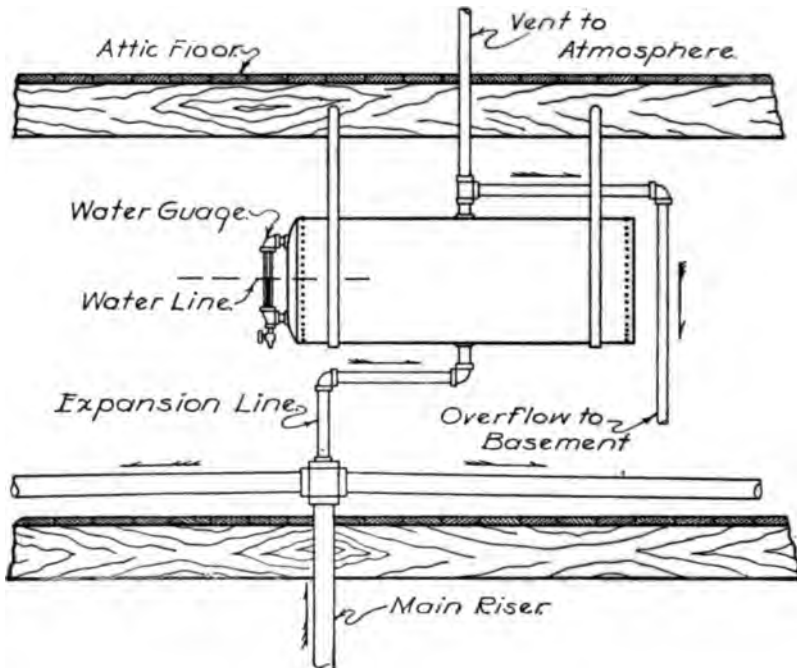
Expansion Tank Connection—Horizontal for Overhead System.
